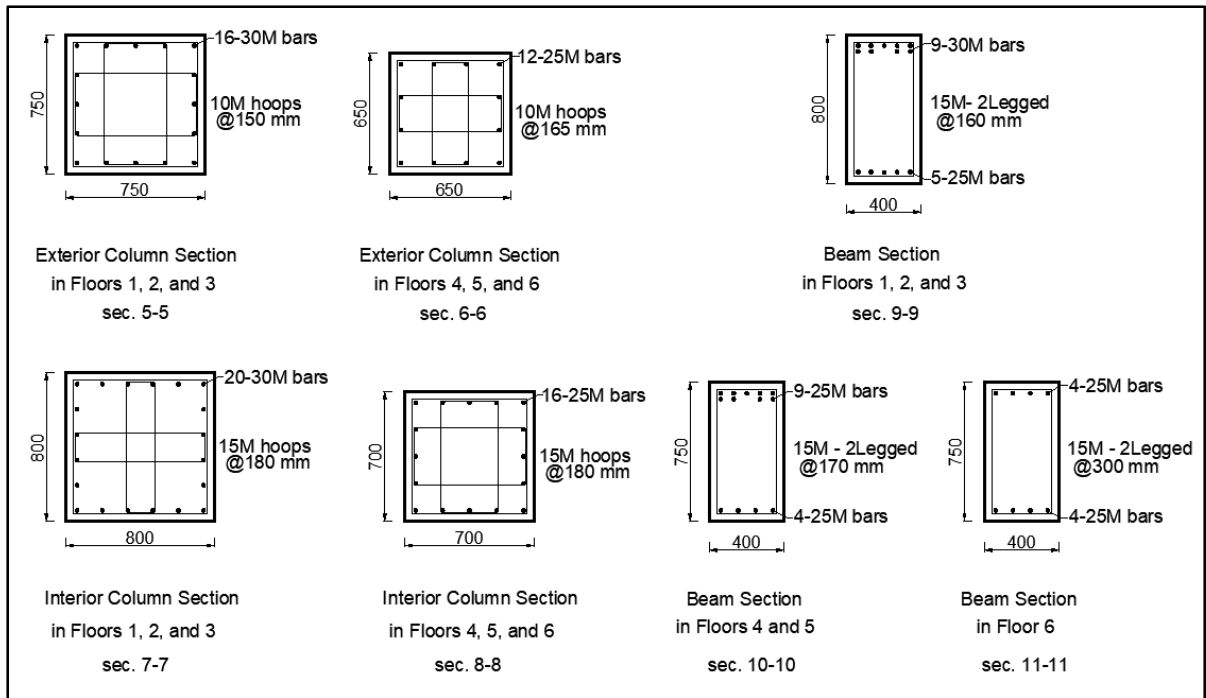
Reinforcing details of the conventionally constructed frames in Vancouver
